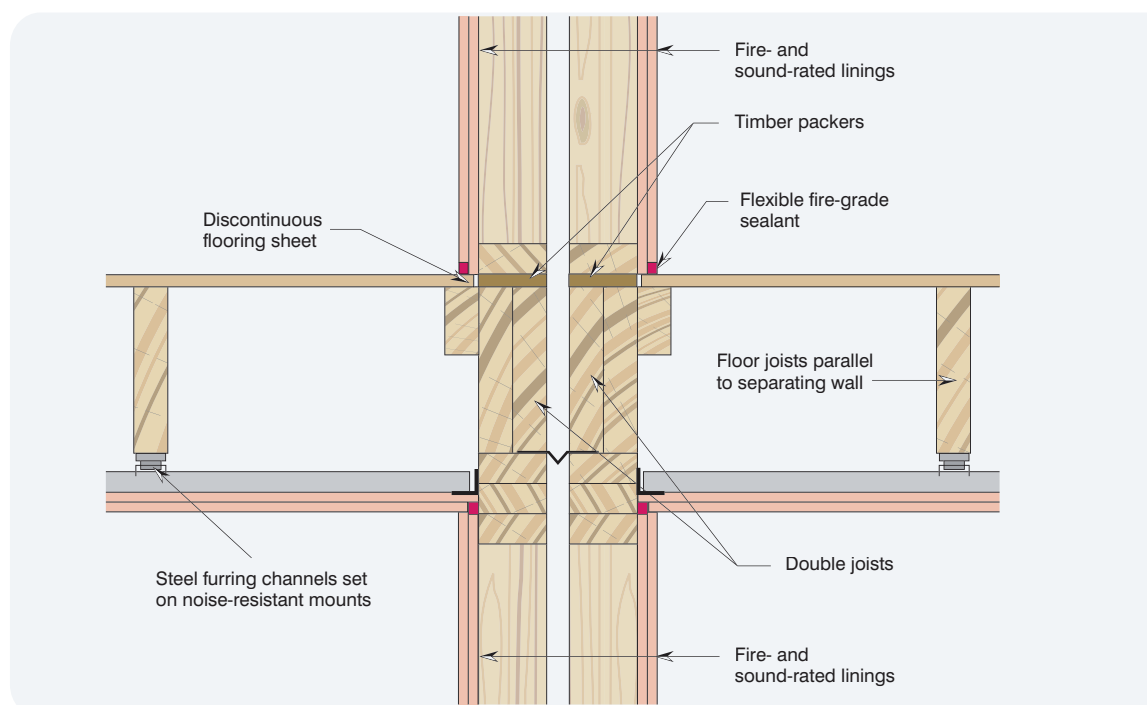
Discontinuous floor joist and floor sheeting – elevation view.
